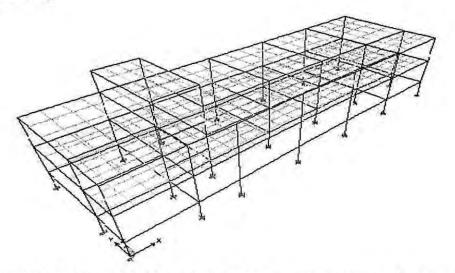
3D view of the FE model of a CDSP-2 type cyclone shelter (without bracing)
